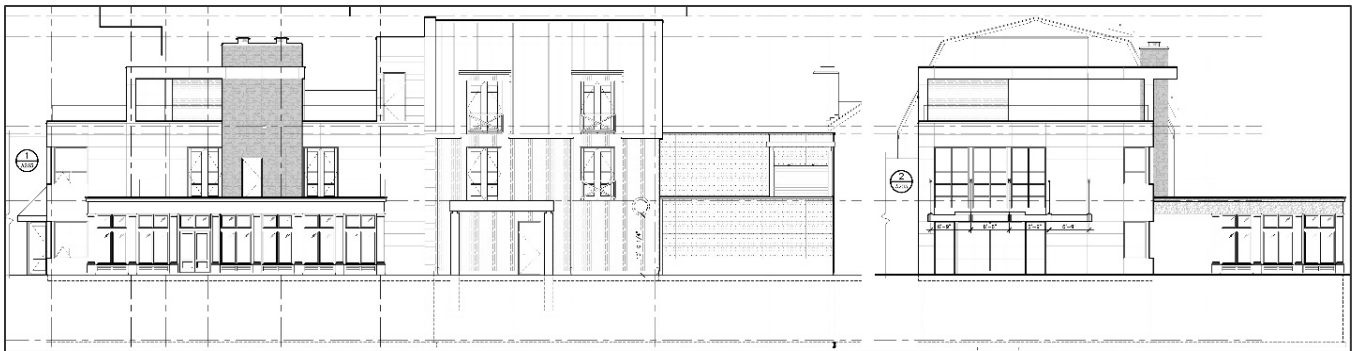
North and East Elevations, North Wing (source: Shoalts and Zaback Architects)
